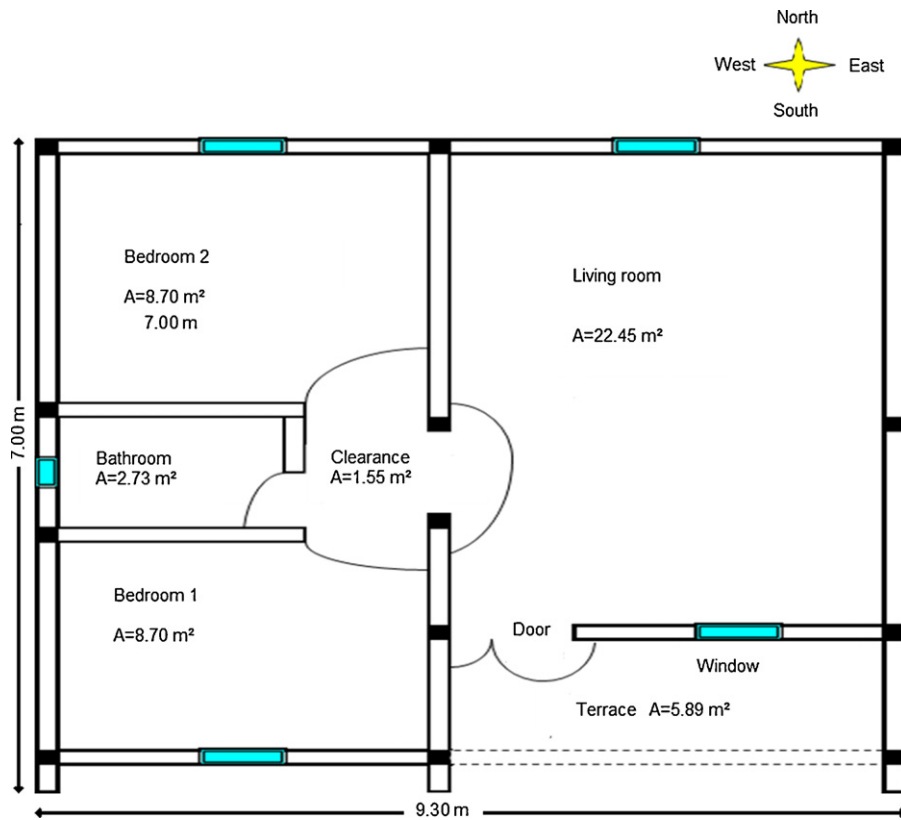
Floor plan of the investigated building with orientation, dimensions, and surface areas.
